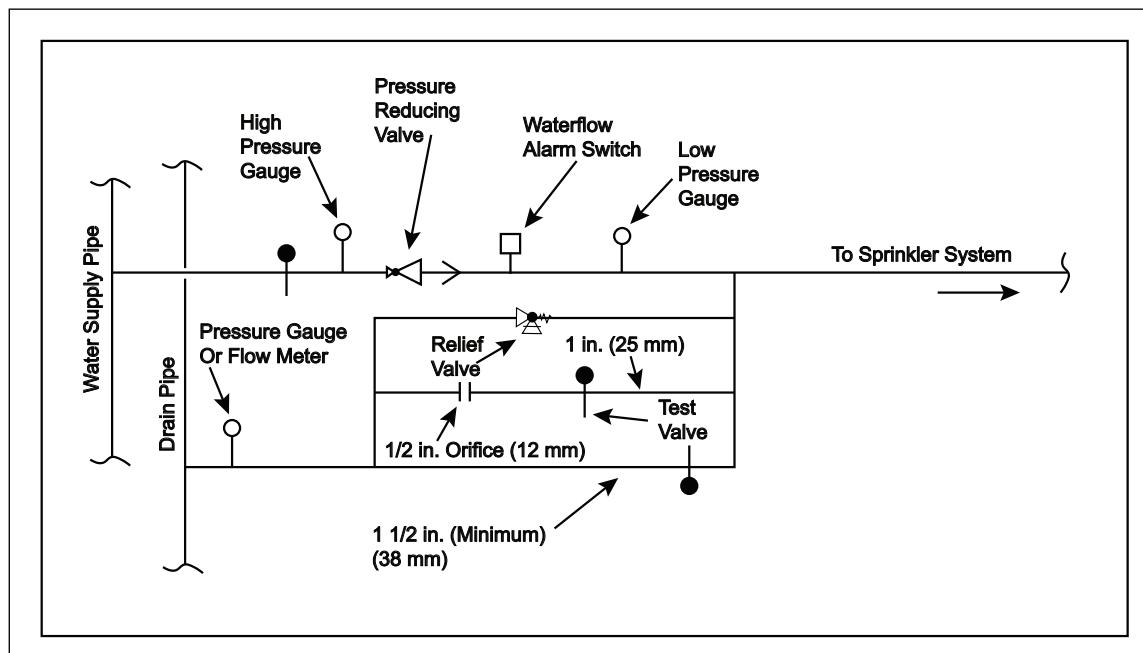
Pressure reducing valve installation for individual sprinkler system (Note: A check valve is not needed for pressure reducing valves that have a check valve function incorporated in their design.)
